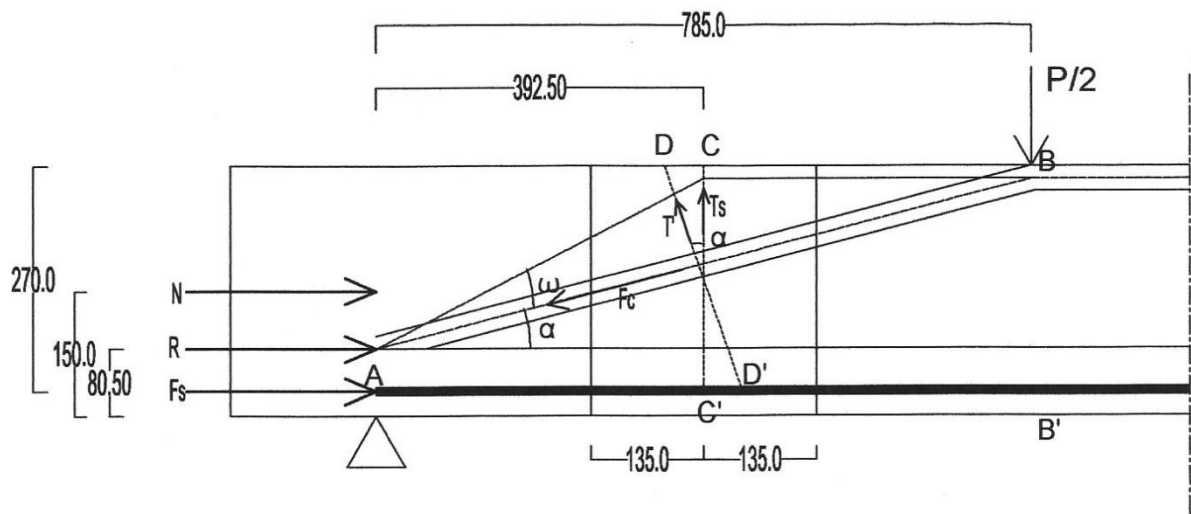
Transverse Reinforcement design for beam with axial load.
